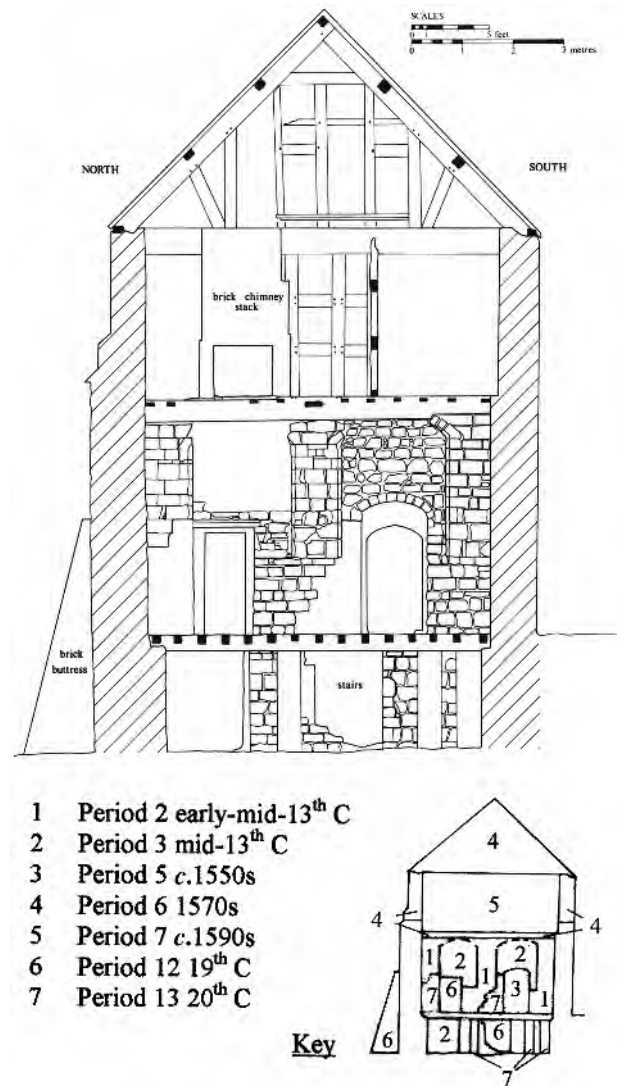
Internal elevation: north range – west face of east gable (1:150)
